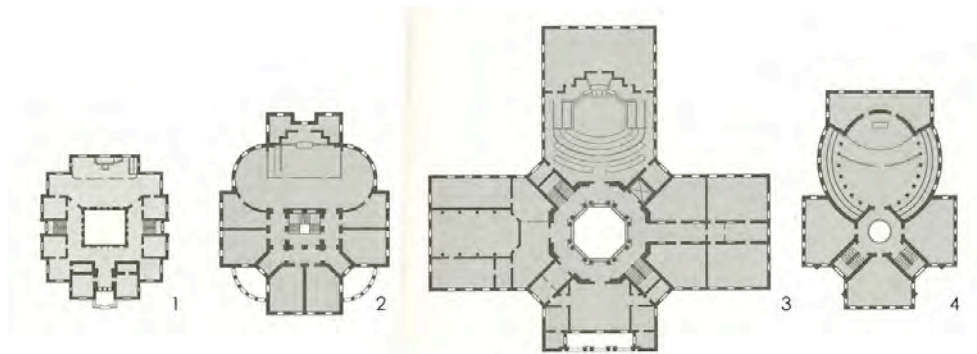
Overview of typological layouts adopted by James Riley Gordon: 1. Hollow plan; 2. Signature plan; 3. Capitol plan; 4. Copiah plan. (from Meister, 2011)
